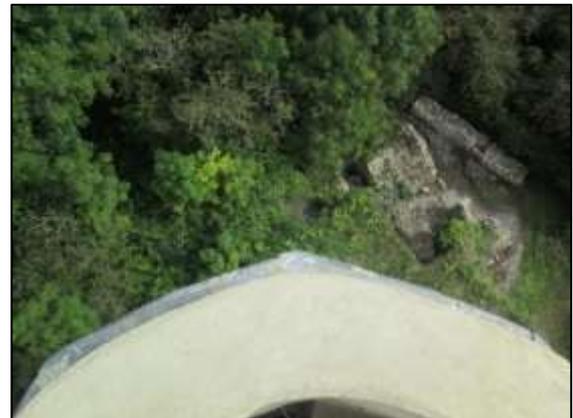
Finished ring from above, with the lead flashing just visible on the outside edge and the Vertical Engine House towards the top right corner. © C Skelton, 2014.
